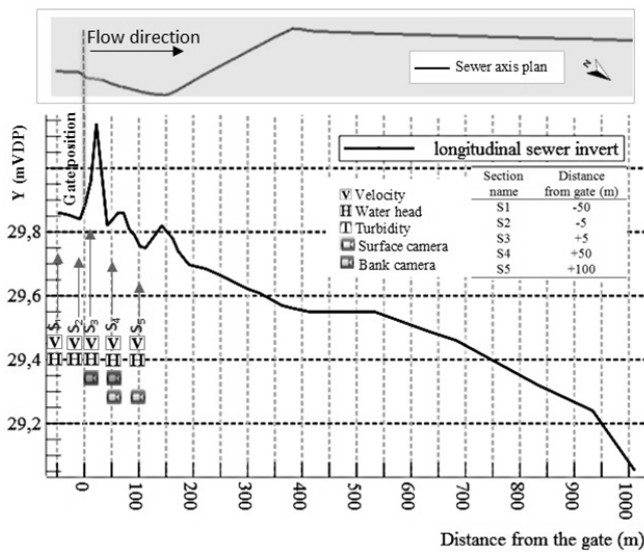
Profile and plan view of sewer channel axis and implemented measurement tools
